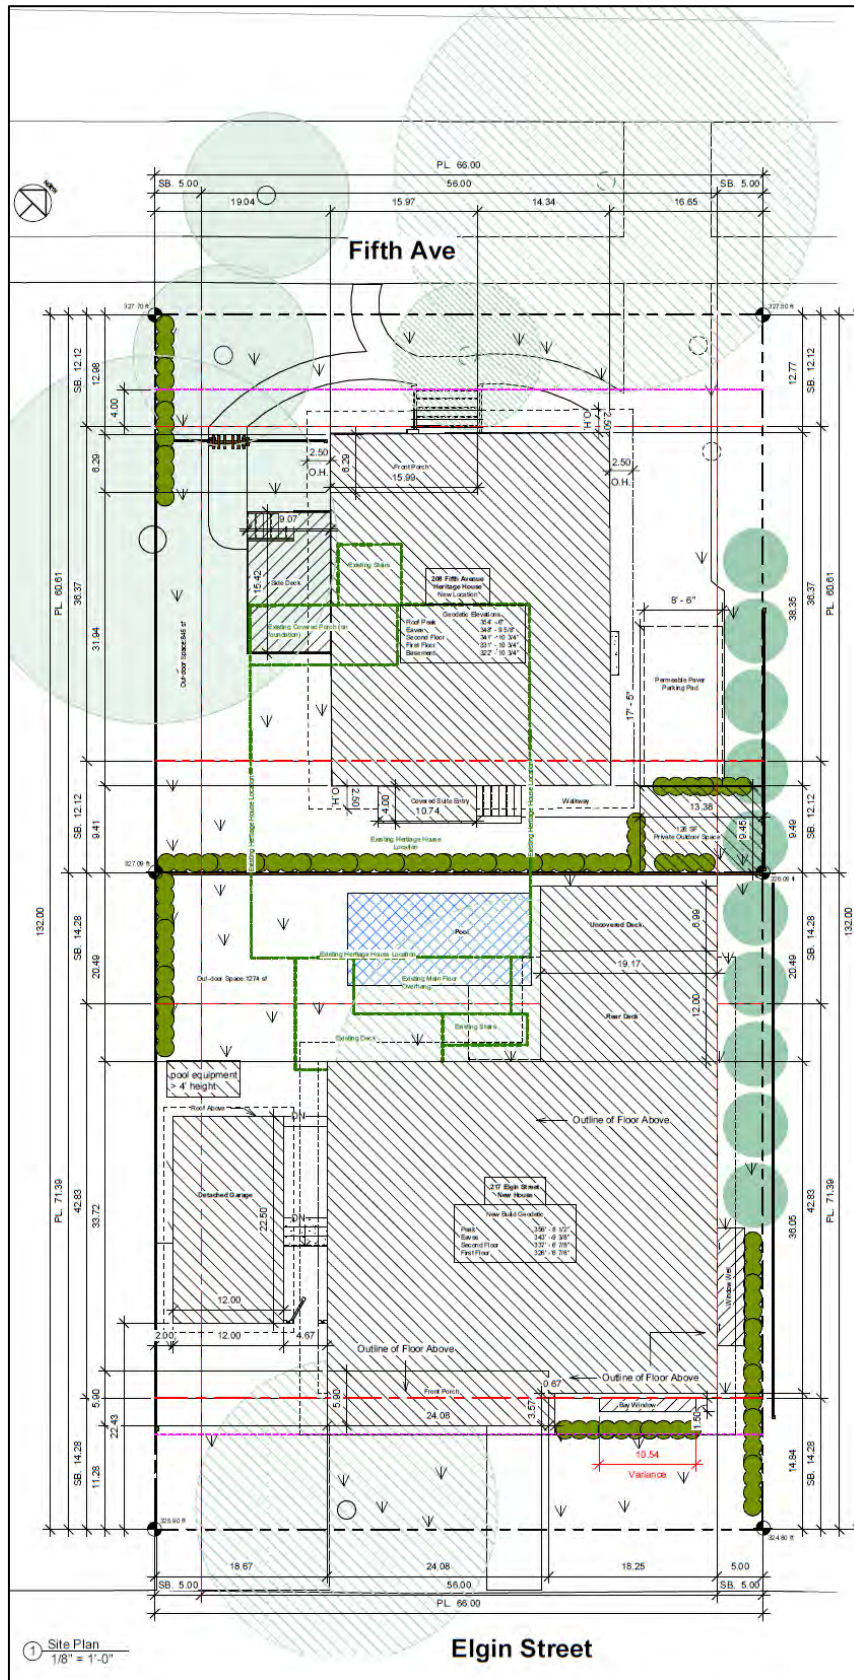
Site plan illustrating the proposed subdivision of 208 Fifth Avenue to facilitate a new build construction at the back of the lot, front Elgin Street. (Source: D3 Dimension, Drafting and Design Inc.)
